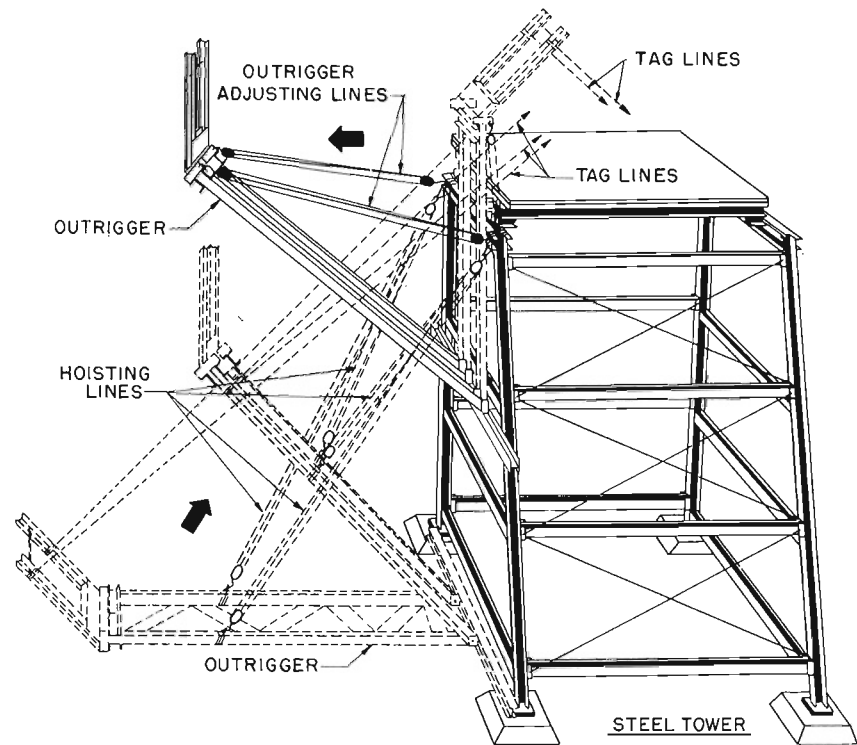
Two gin poles connected with bracing, rollers, and guide frame serve as outriggers used to launch long steel stringers from bridge deck. Successive steps in raising outriggers are shown.
